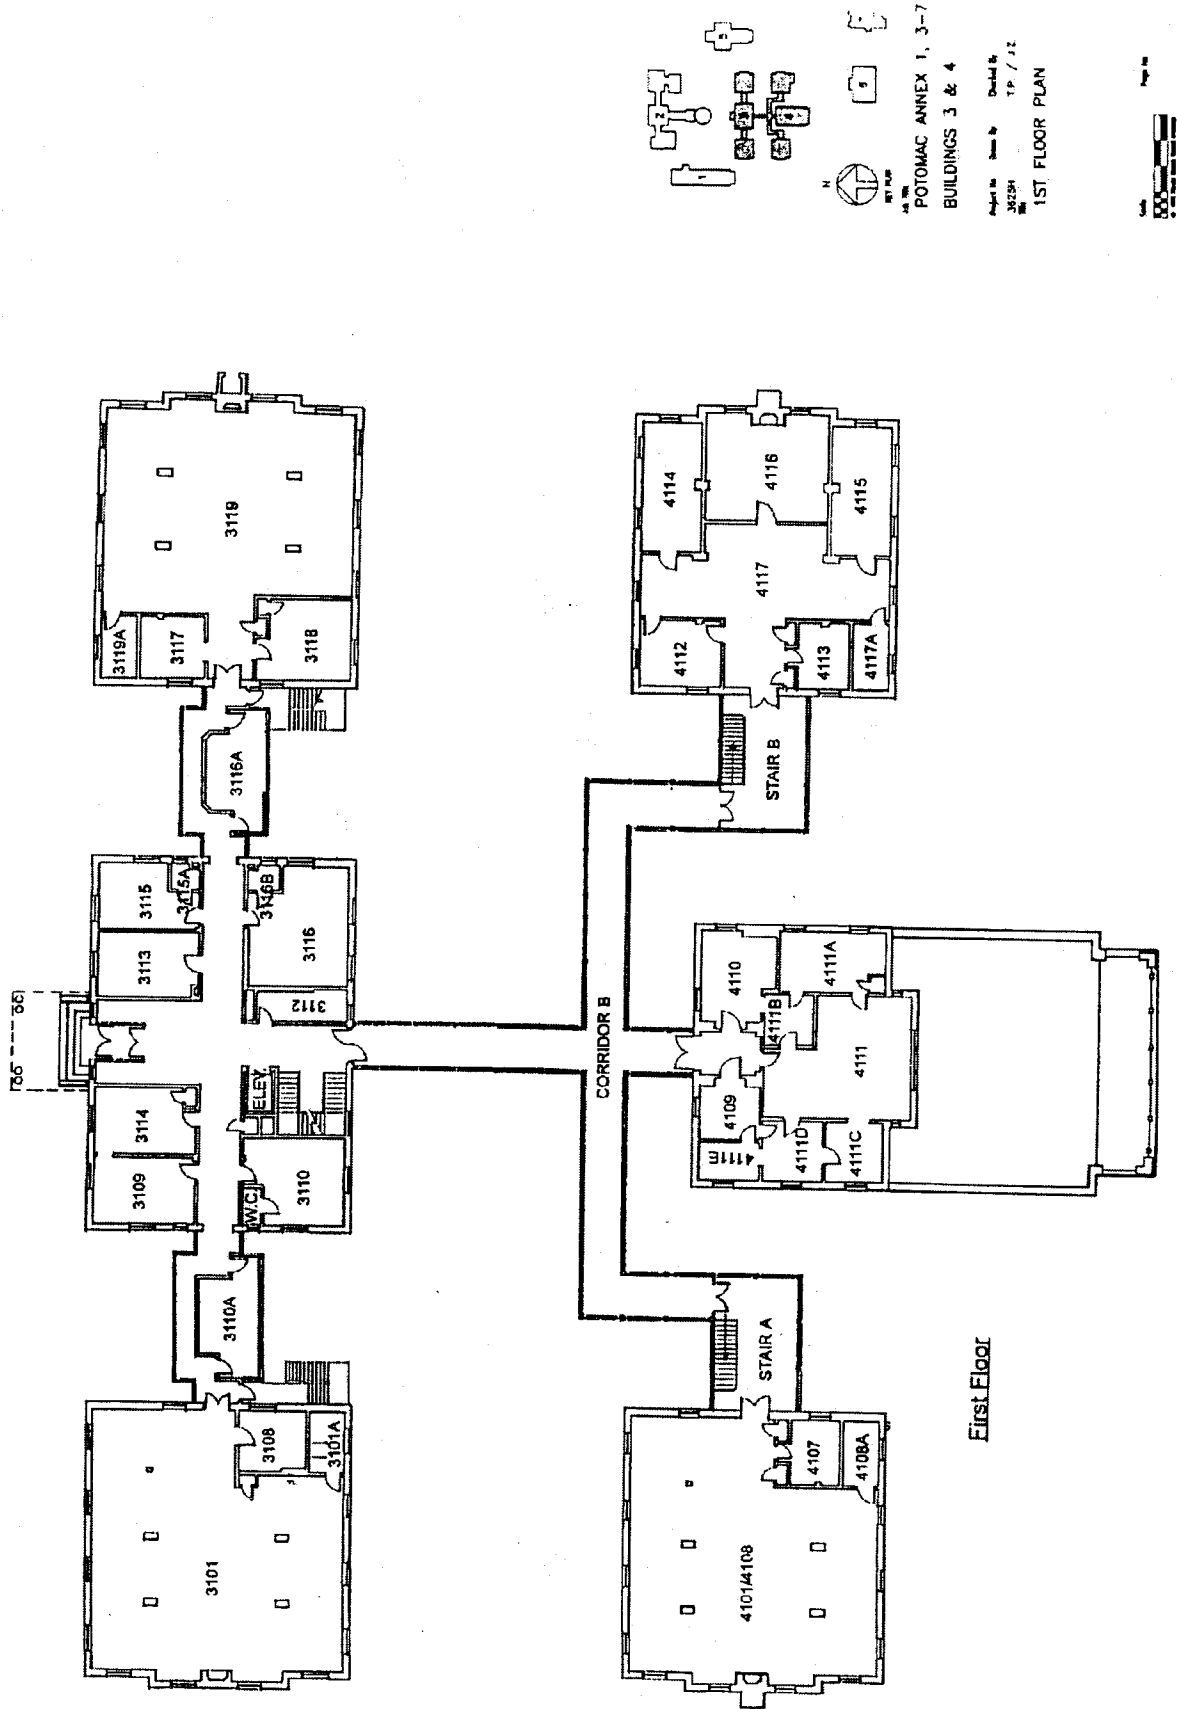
Figure G Building 3 and Building 4. First Floor Plan. This plan shows how the glazed solarium corridors connect Buildings 3 and 4 with each other and with the ward pavilions.
